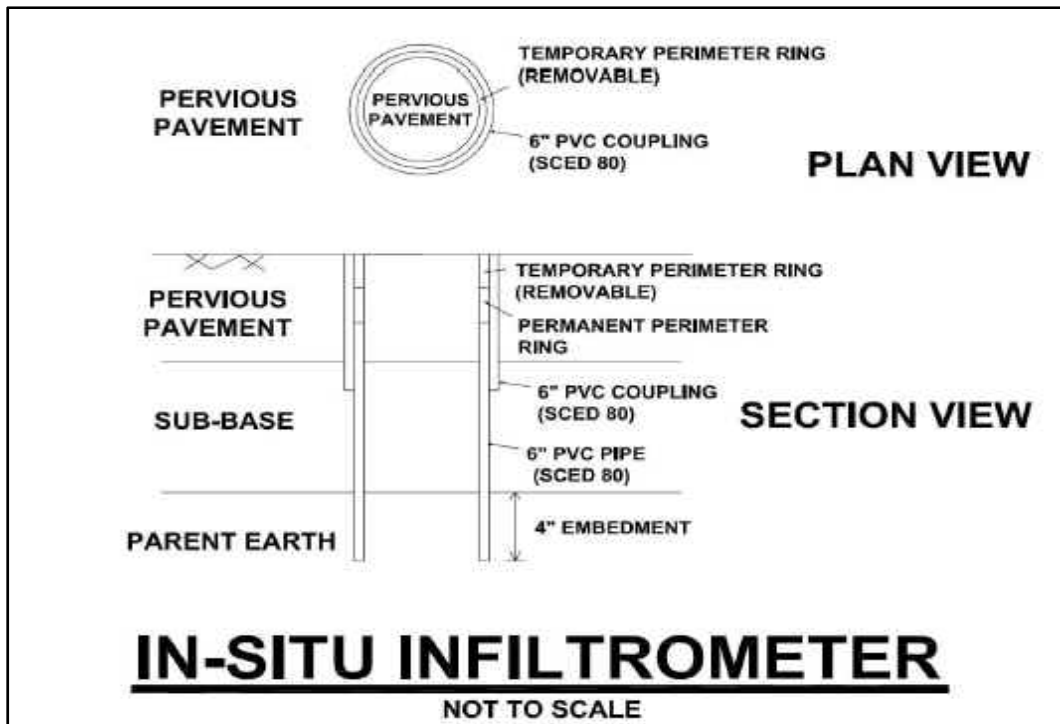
Plan and Section View of ERIK In-Situ Infiltrometer
